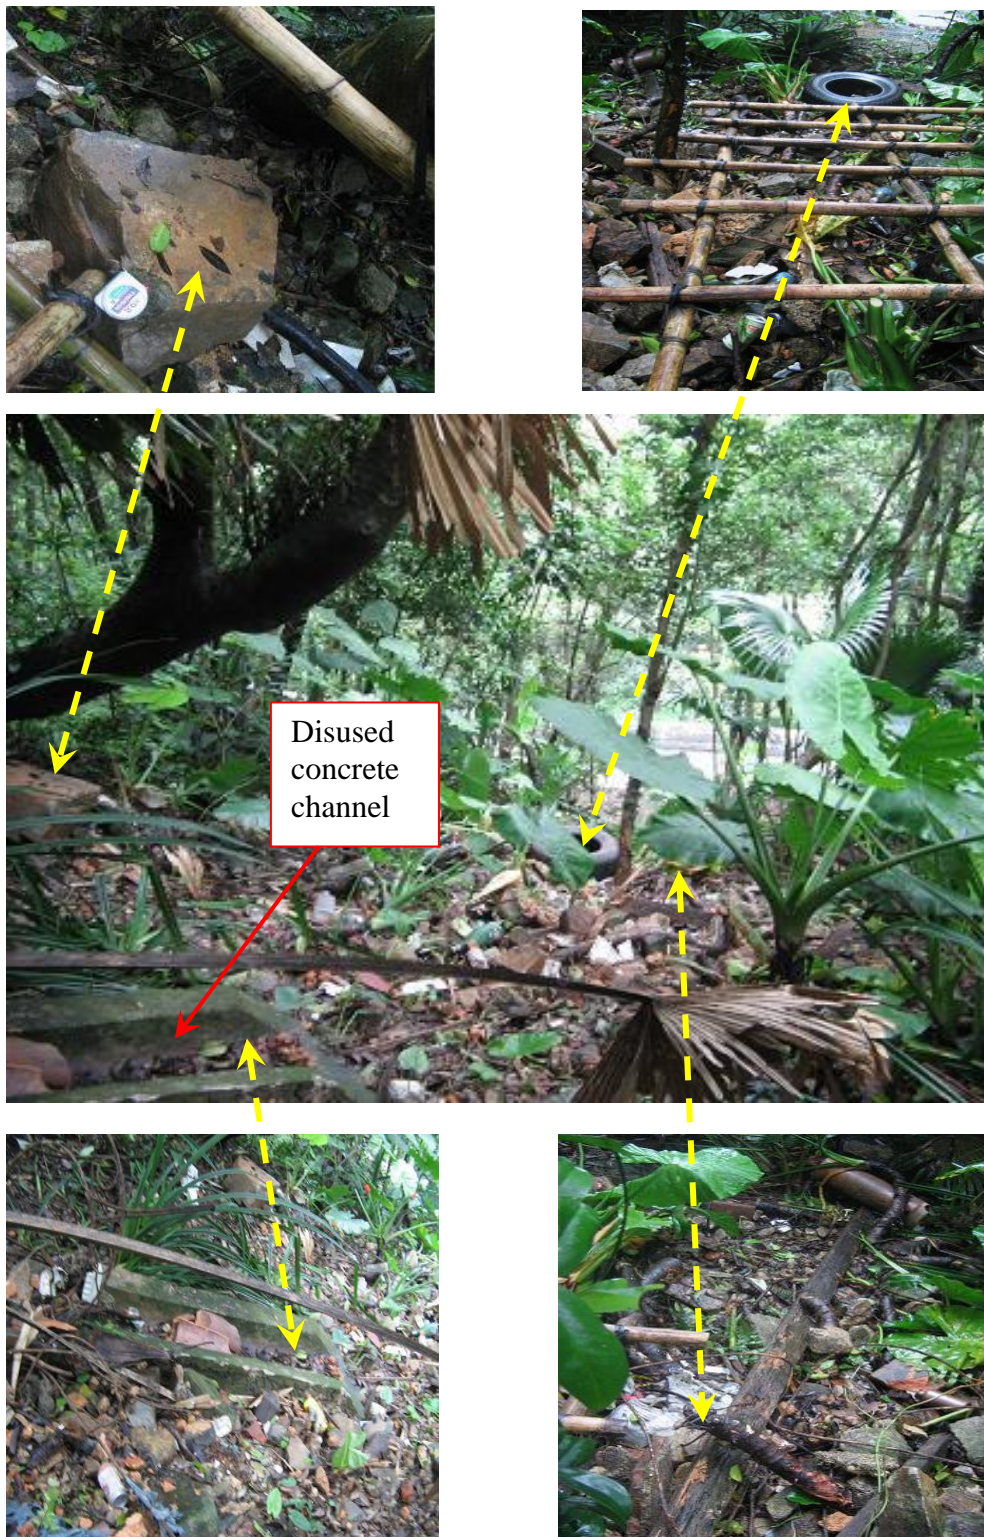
Hillside below the Failure Scar Strewn with Construction Debris, Refuse and Rock Blocks
